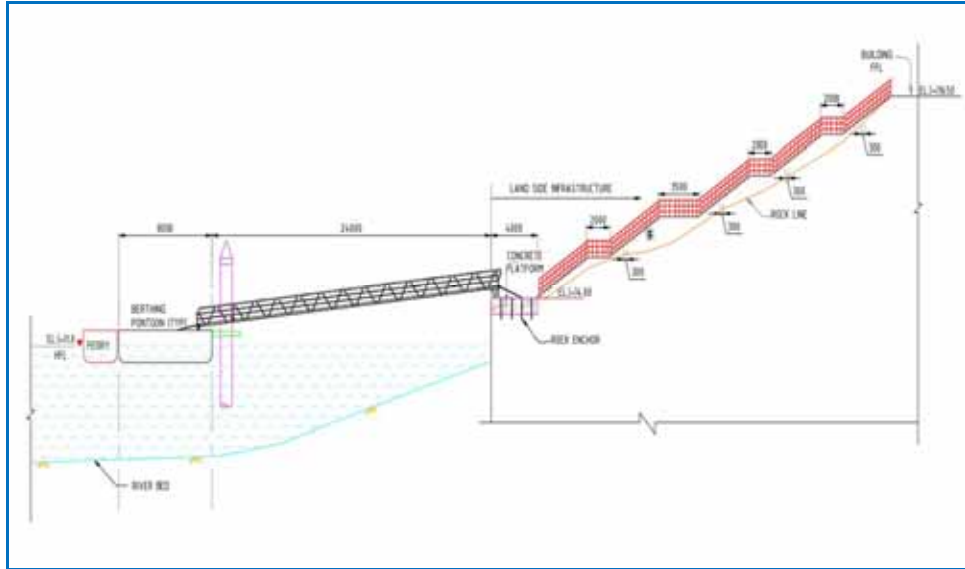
General arrangement of berthing pontoon at Low Water Level (Virje- Downstream of Kadra Dam)
